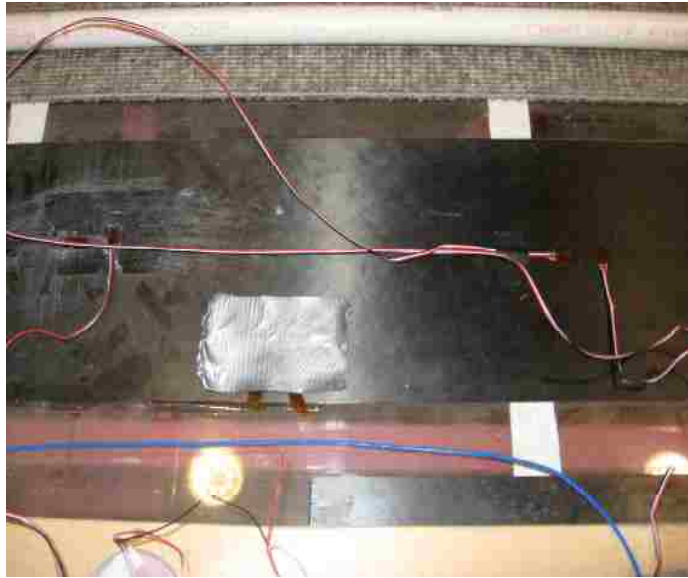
CFRP strip installed on the model bridge deck with strain gauges installed on the CFRP.
